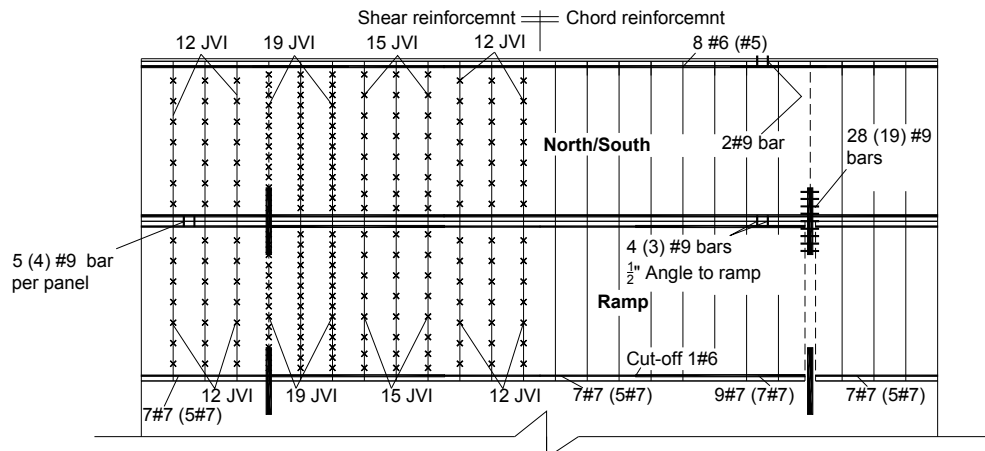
Diaphragm reinforcement design for design example 2B.
